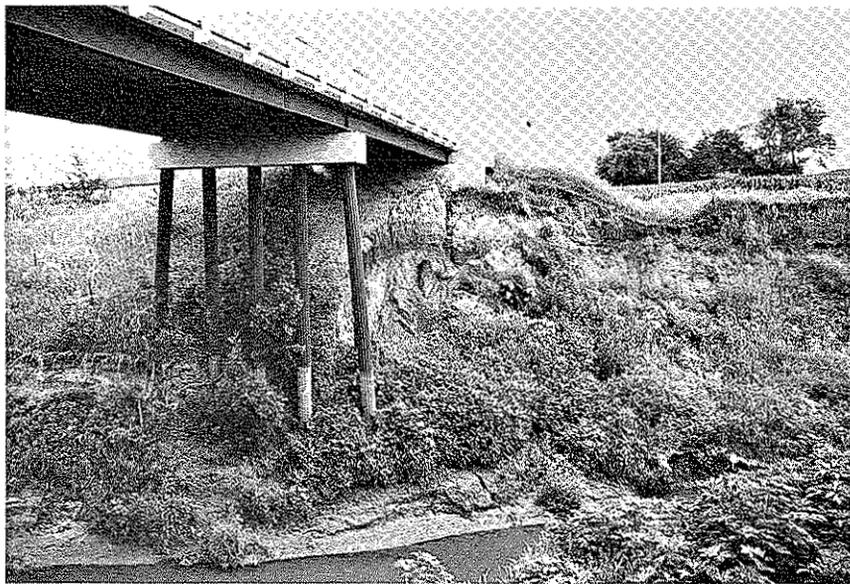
Channel degradation has exposed portions of these piles. Former ground level is indicated by the top of the light-colored portion at bottom of piles. Note also the soil pulling away from the abutment.
